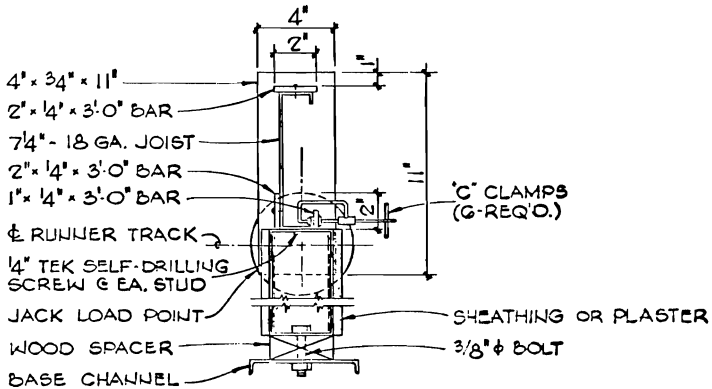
Test Assembly Plan & Details - Wall Type "R"
